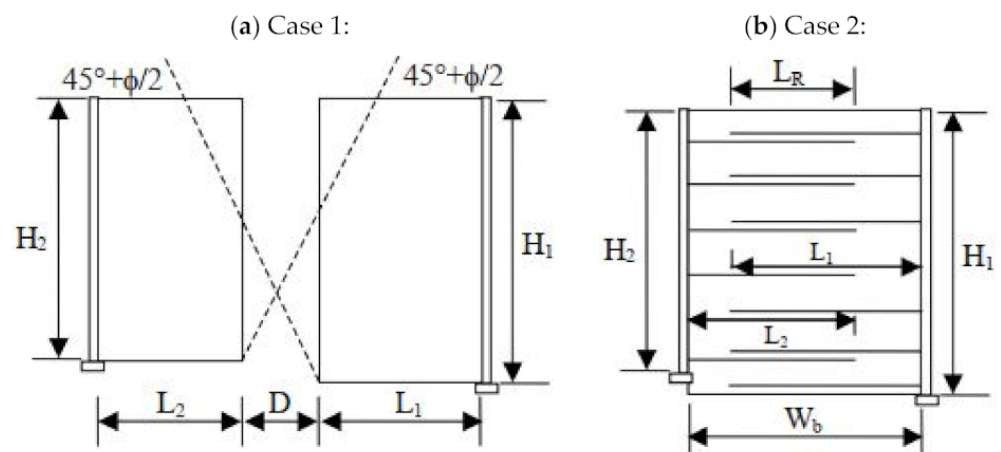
Back-to-back reinforced soil wall definitions: Case 1 (a) and Case 2 (b). (Source: FHWA [2]).
